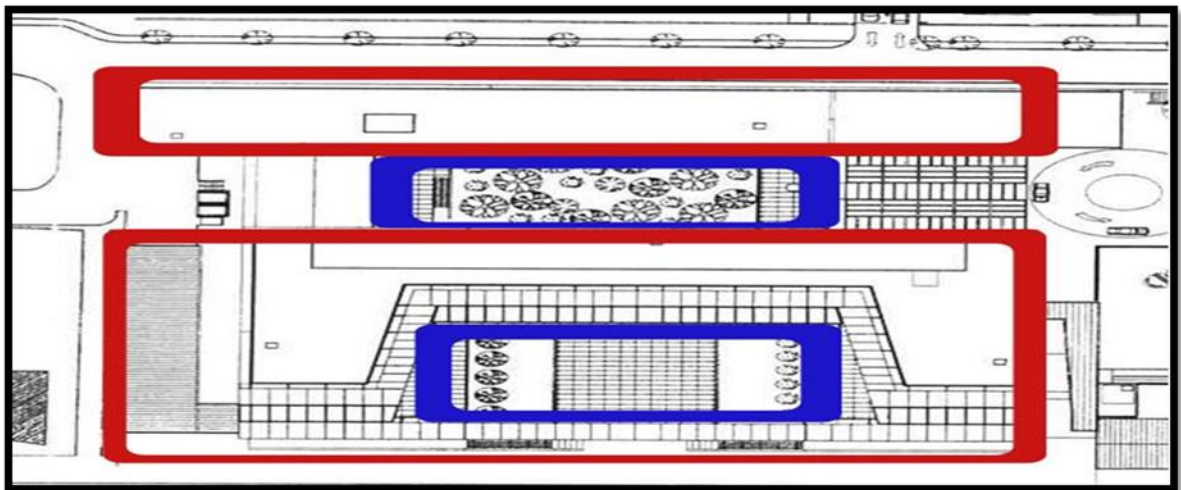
Compositions architectures. Source: Architectural Design - New Health Facilities.
